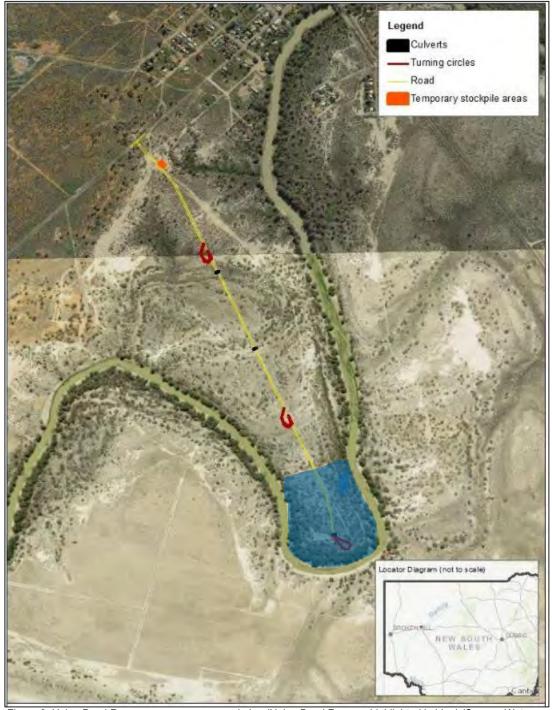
Union Bend Reserve – new access road plan (Union Bend Reserve highlighted in blue) (Source: Water NSW REF 2021)
